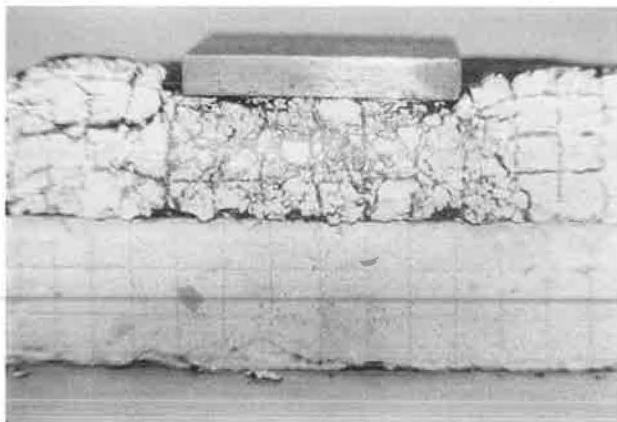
Loaded asphalt/concrete model, failure at top.
